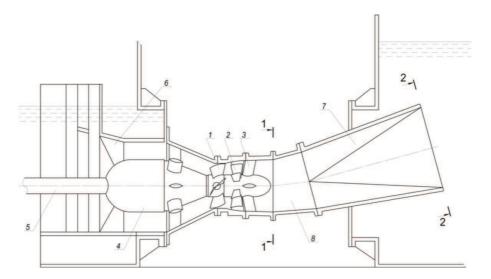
A pumping station model with a horizontal bulb unit: 1 – impeller, 2 – straightening guide vanes, 3 – stay vanes, 4 – streamlined capsule, 5 – shaft housing, 6 – closed watersupply chamber, 7 – outlet tube diffuser, 8 – elbow. Measuring sections (section 1–1) and outlet (section 2–2).
